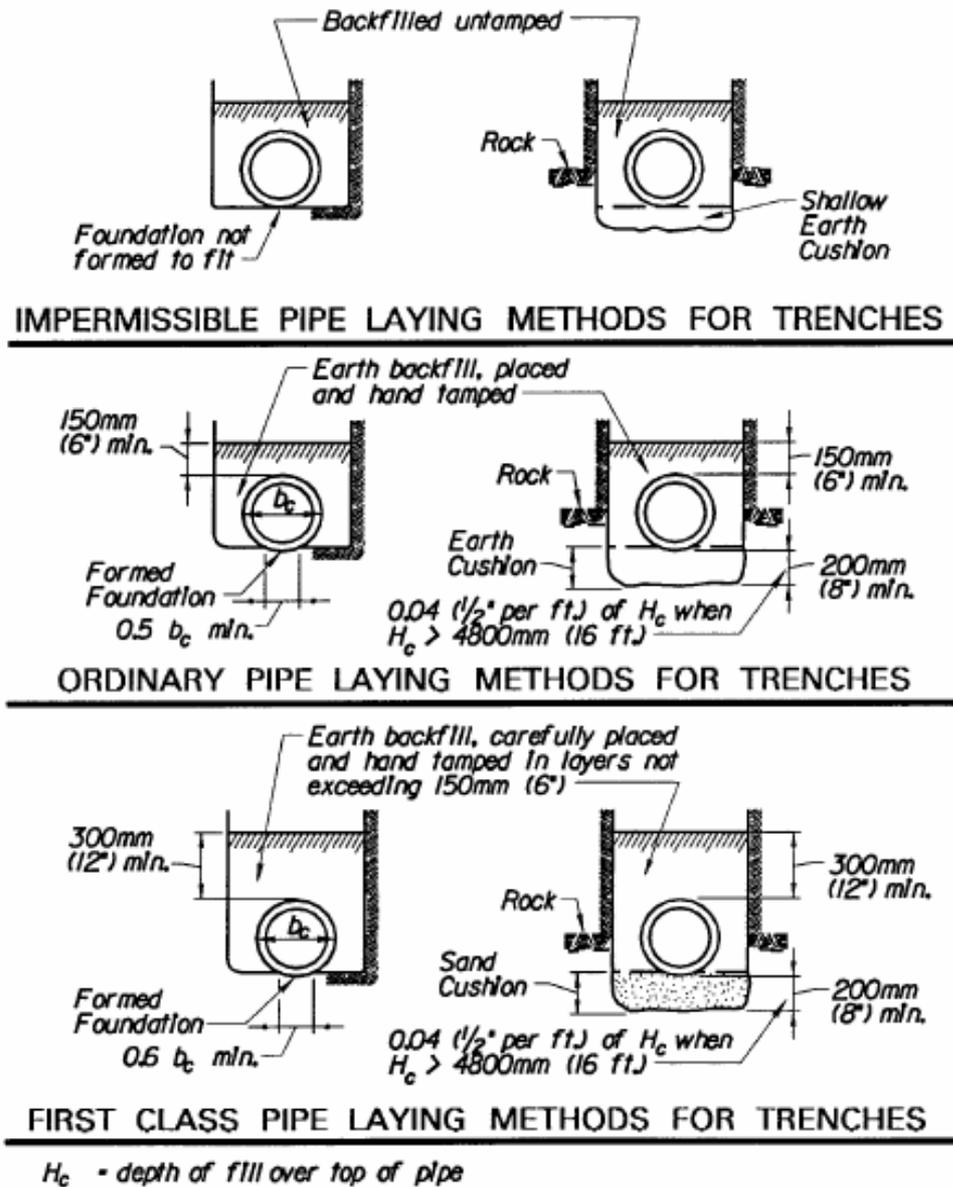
Trench bedding conditions (U.S. Army Corps of Engineers, 1997)
